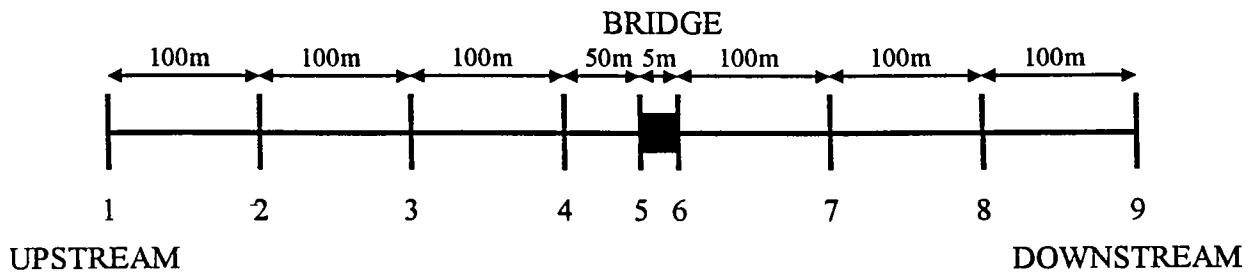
TEST 11 Parts A & B - Plan location of cross sections
